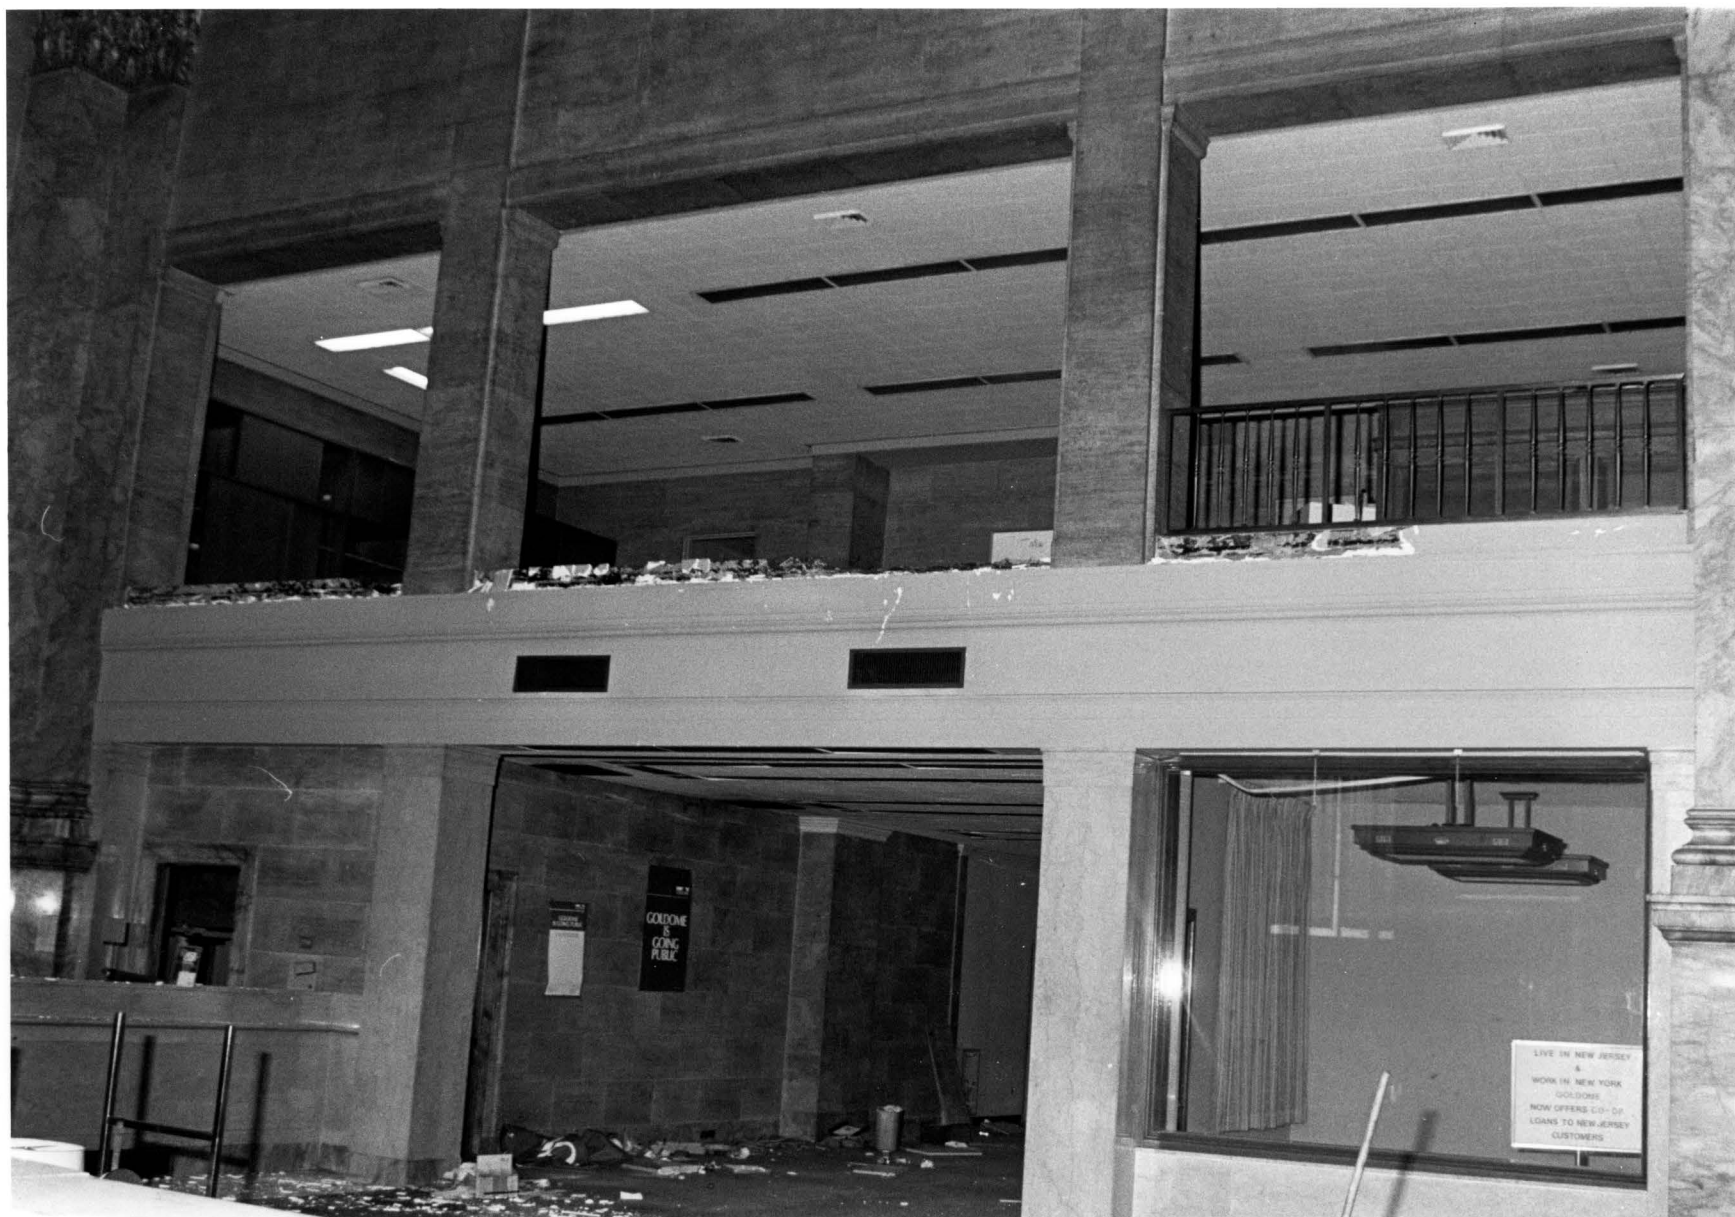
Detail of the Banking Room's north wall -- the elevation to the left (west) of the proscenium. (1988)
